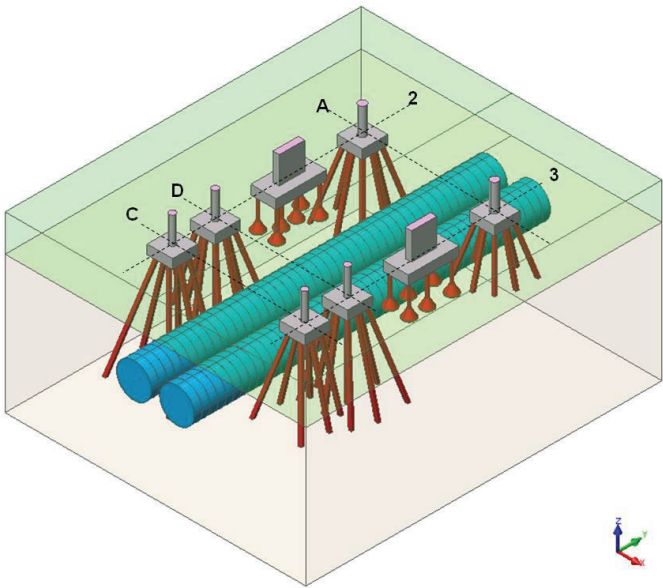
Sketch of RCTC and piles of 4th Street Bridge
